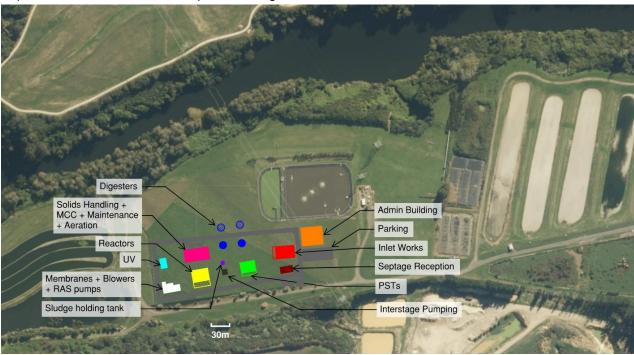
Option 4A Cambridge WWTP Example Layout
